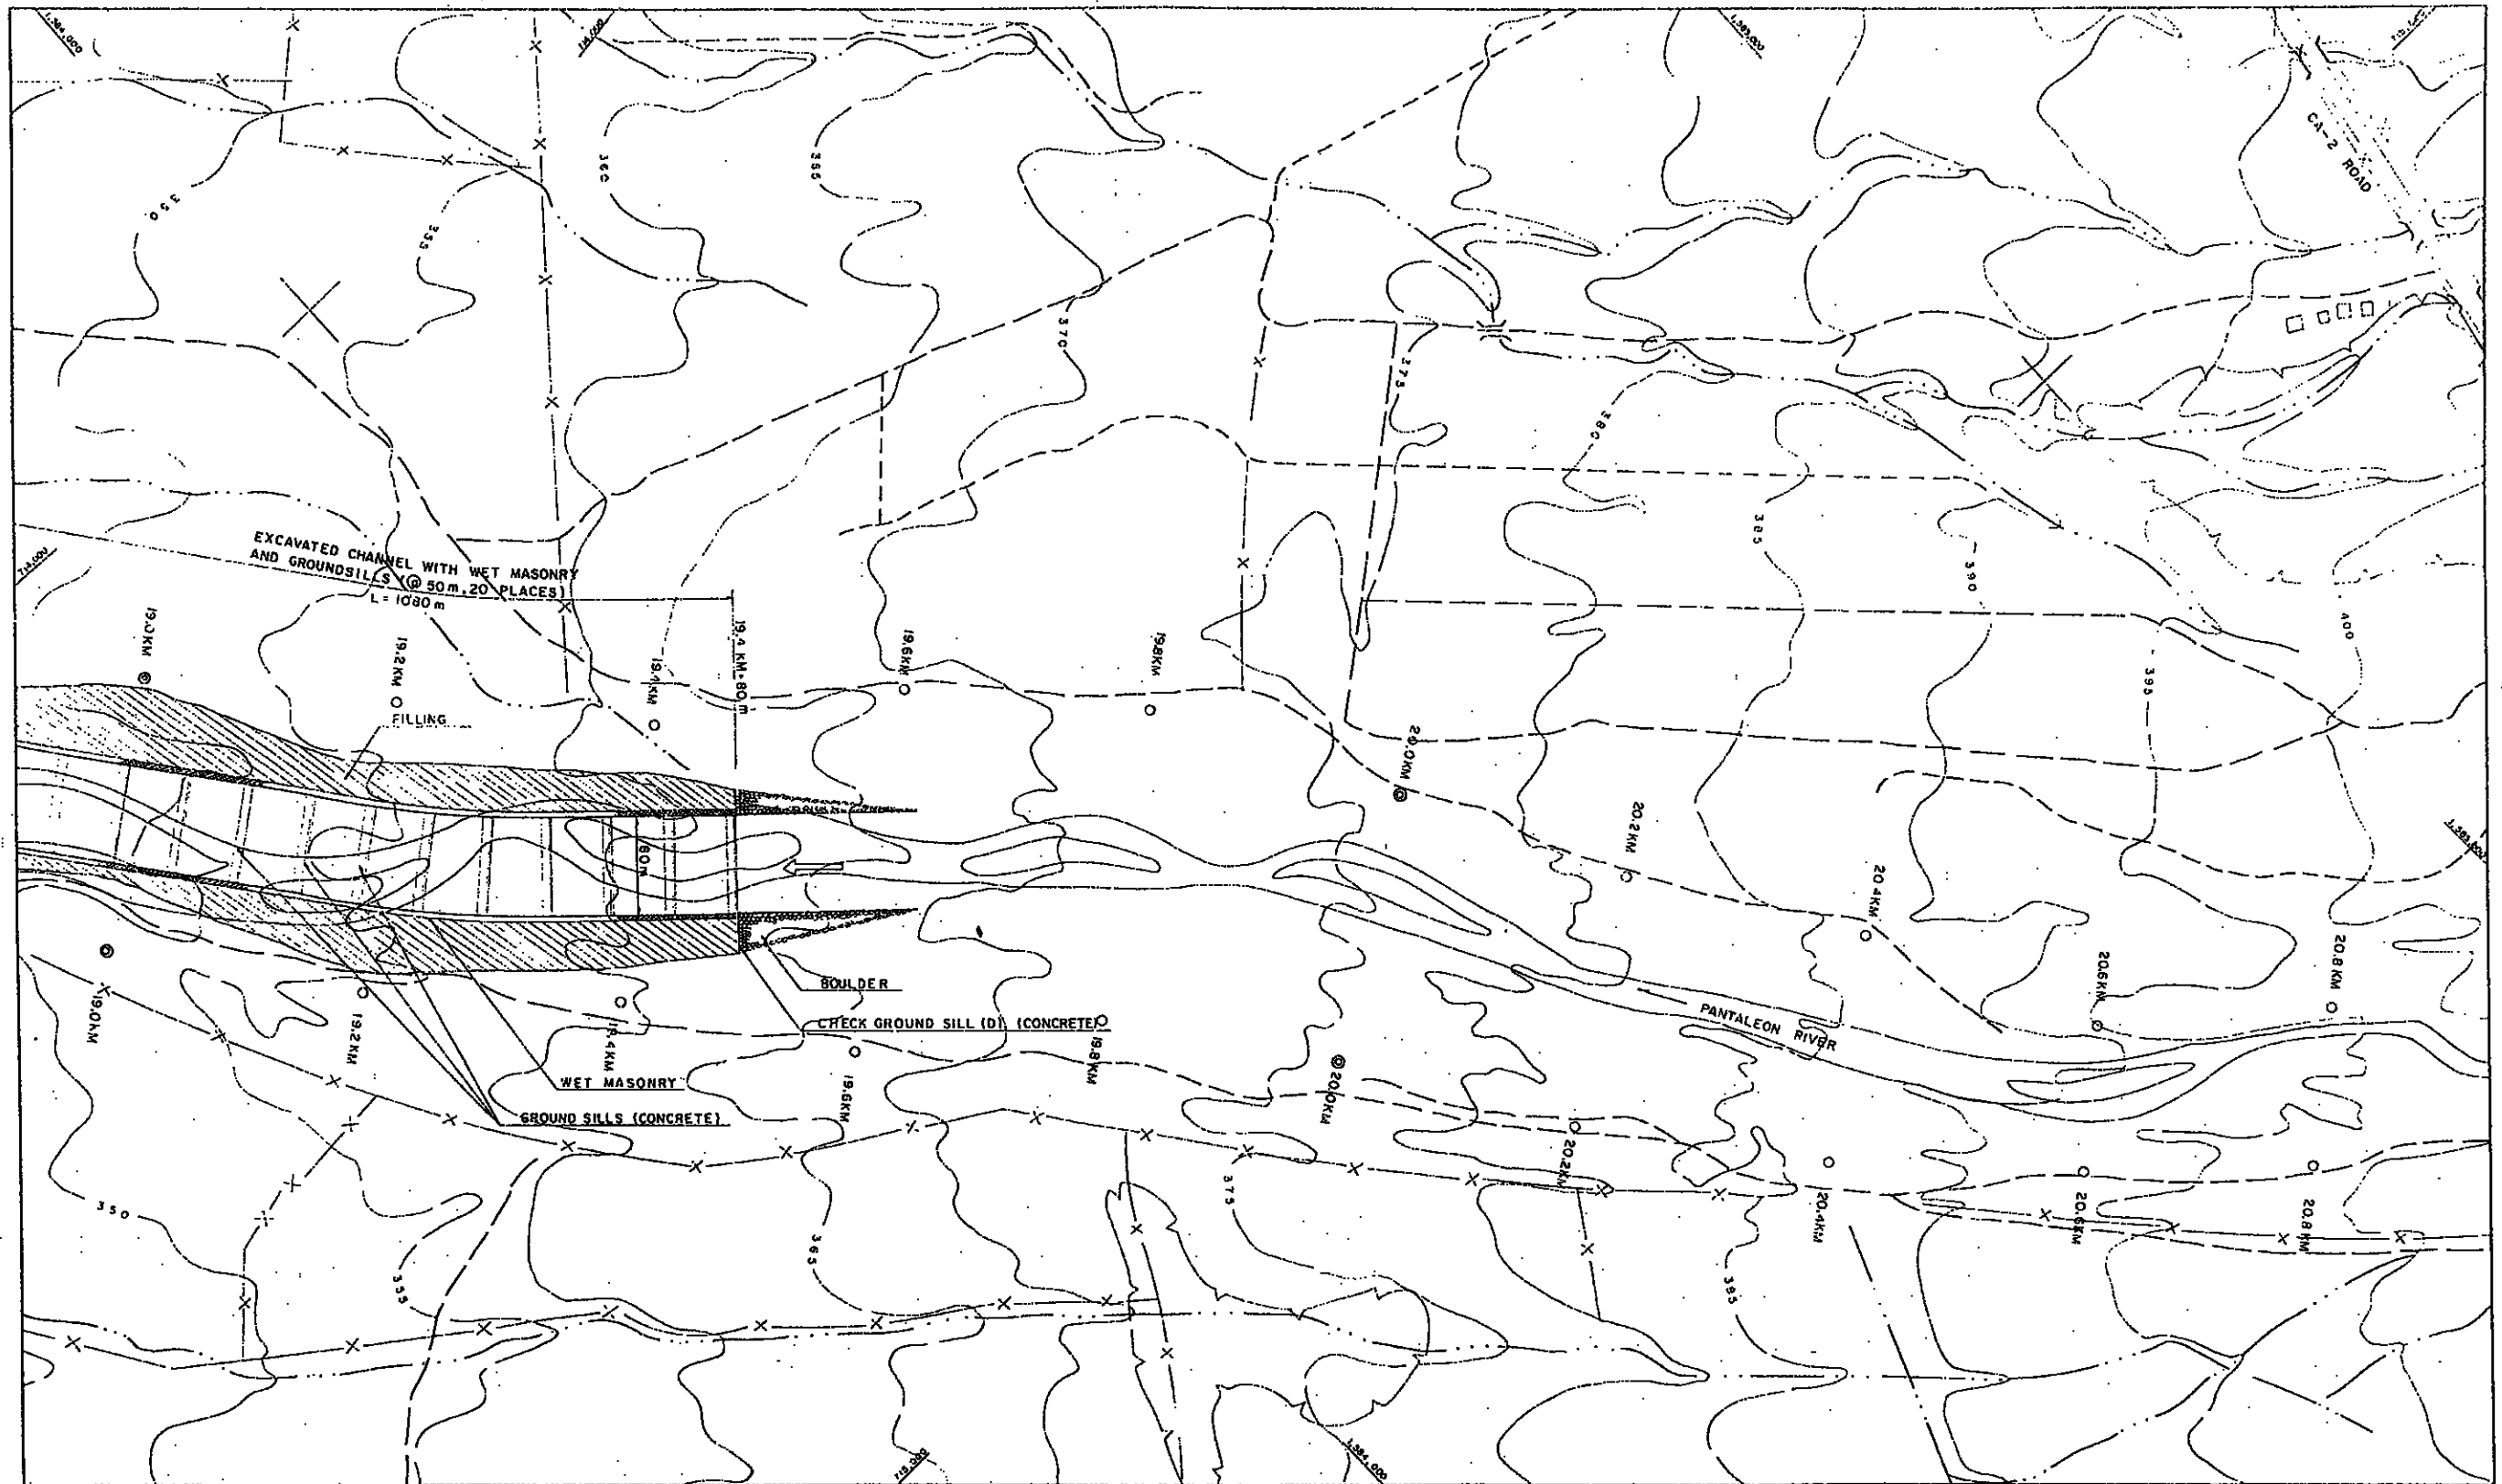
(4/6) PLAN OF RIVER IMPROVEMENT IN THE PROPOSED URGENT PLAN (PANTALEON RIVER)
